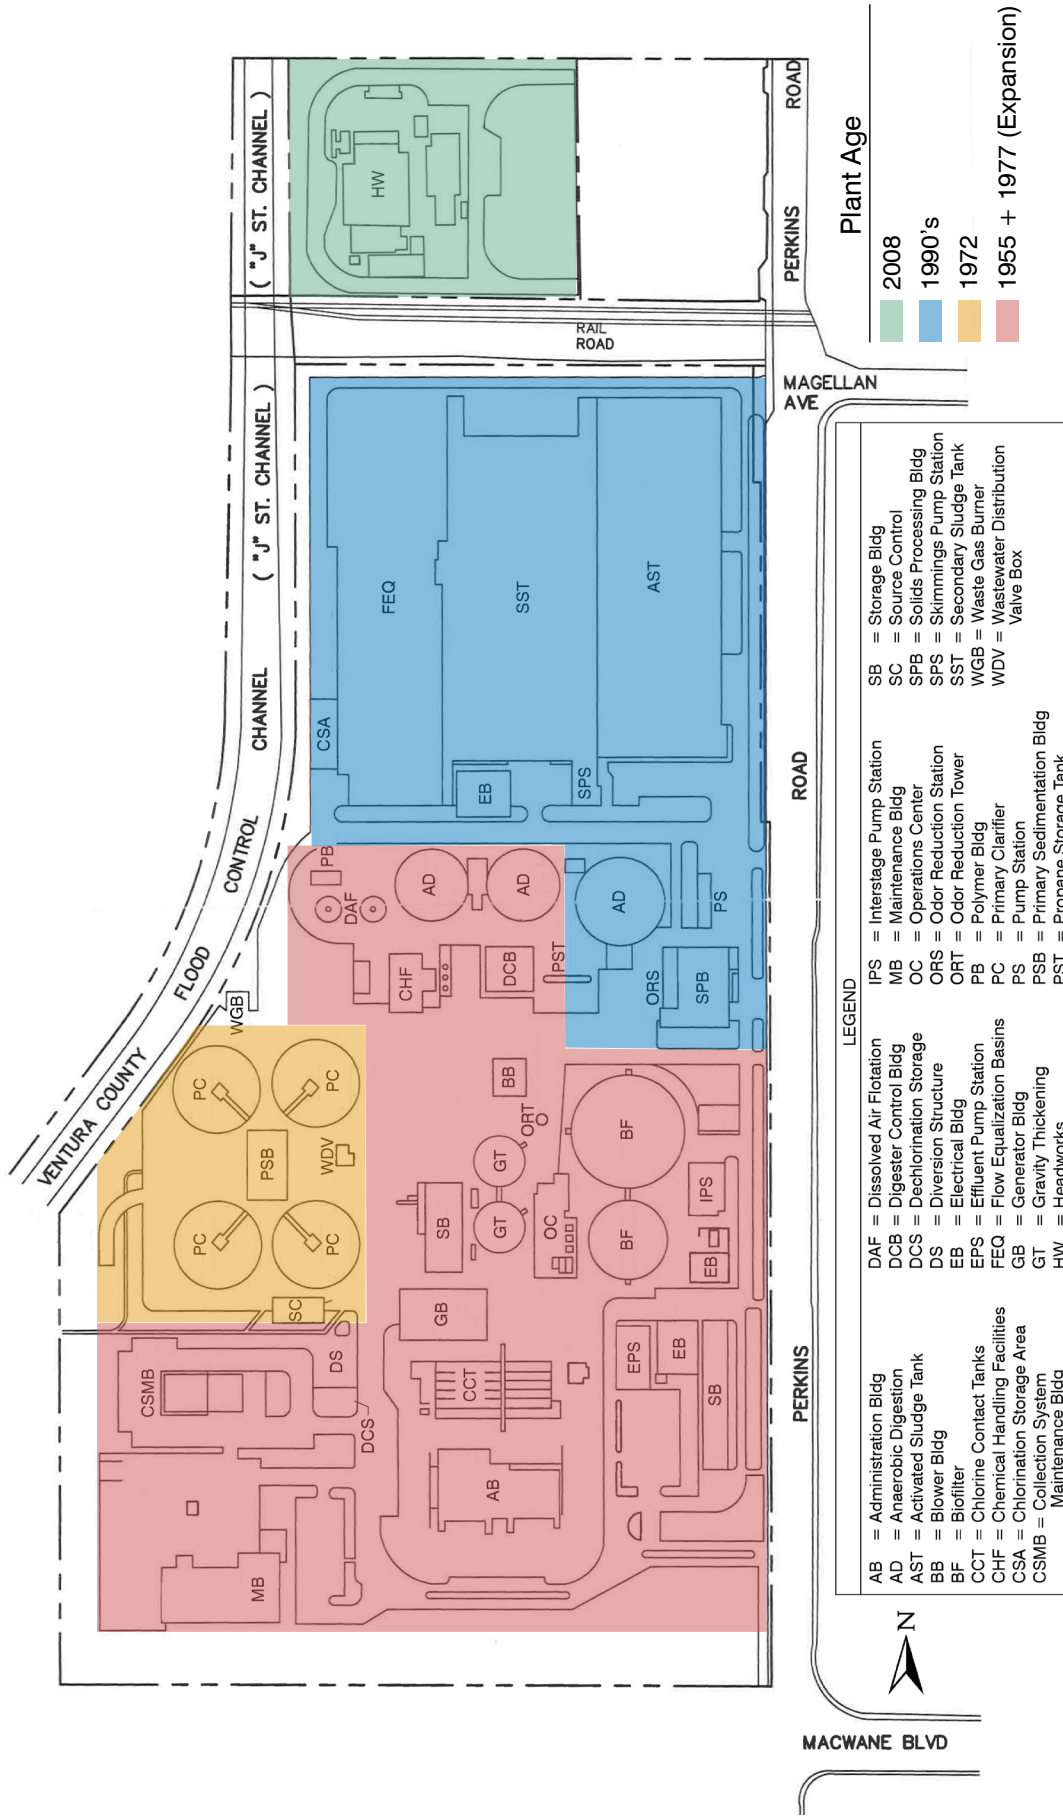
The Oxnard Wastewater Treatment Plant consists of preliminary, primary, and secondary treatment, effluent disinfection and solids handling facilities.
